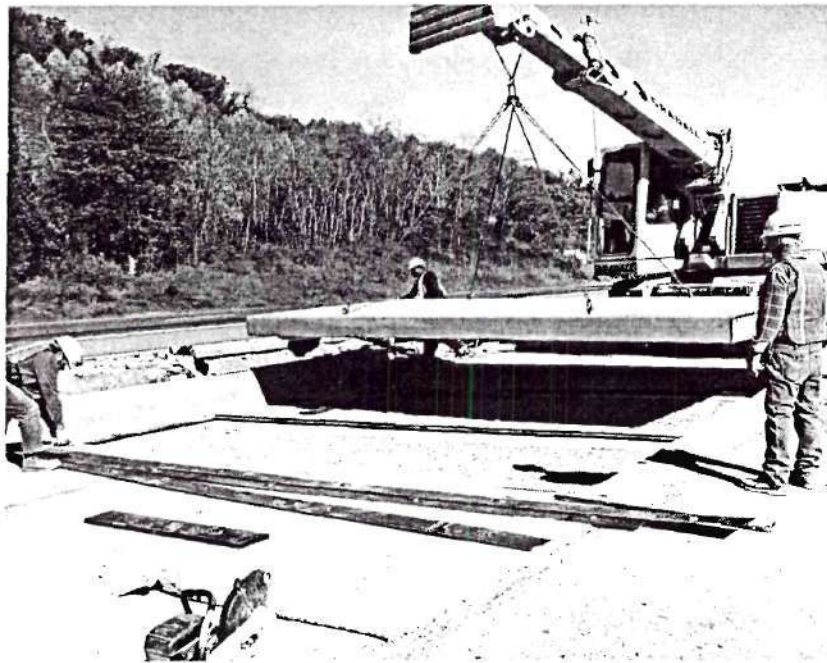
Construction of the V-shaped polymeric bridge deck in Troutville, VA
